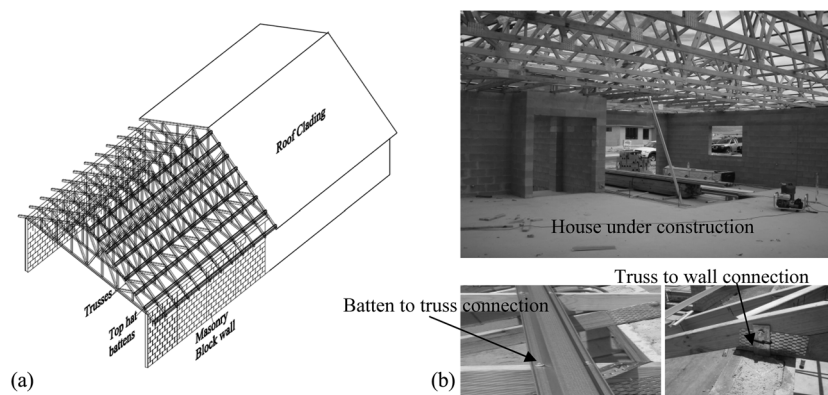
(a) House with masonry walls and (b) Trusses and batten connections
